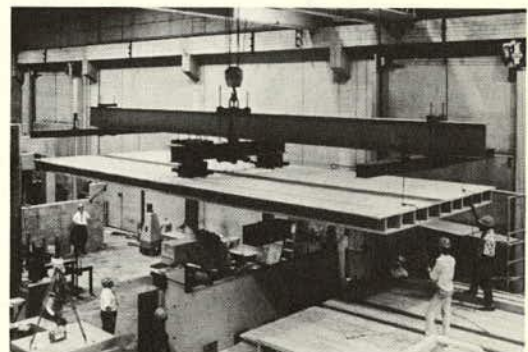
Transport of Double-Column Bridge Model Using Strongback Arrangement
